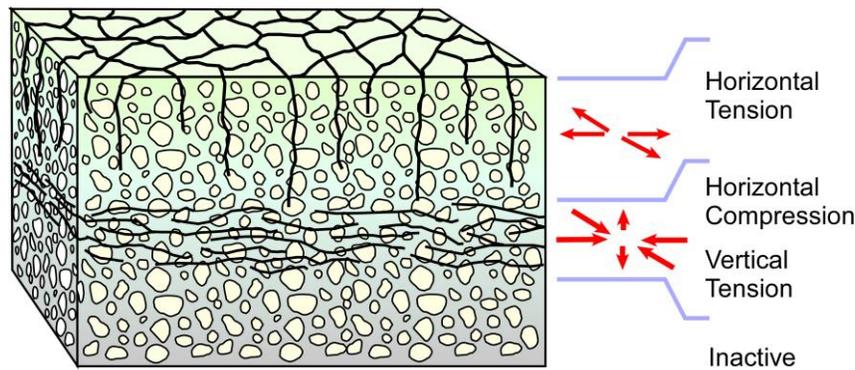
Idealized Sketch of Cracking Pattern in Concrete Mass Caused by Internal Expansion
